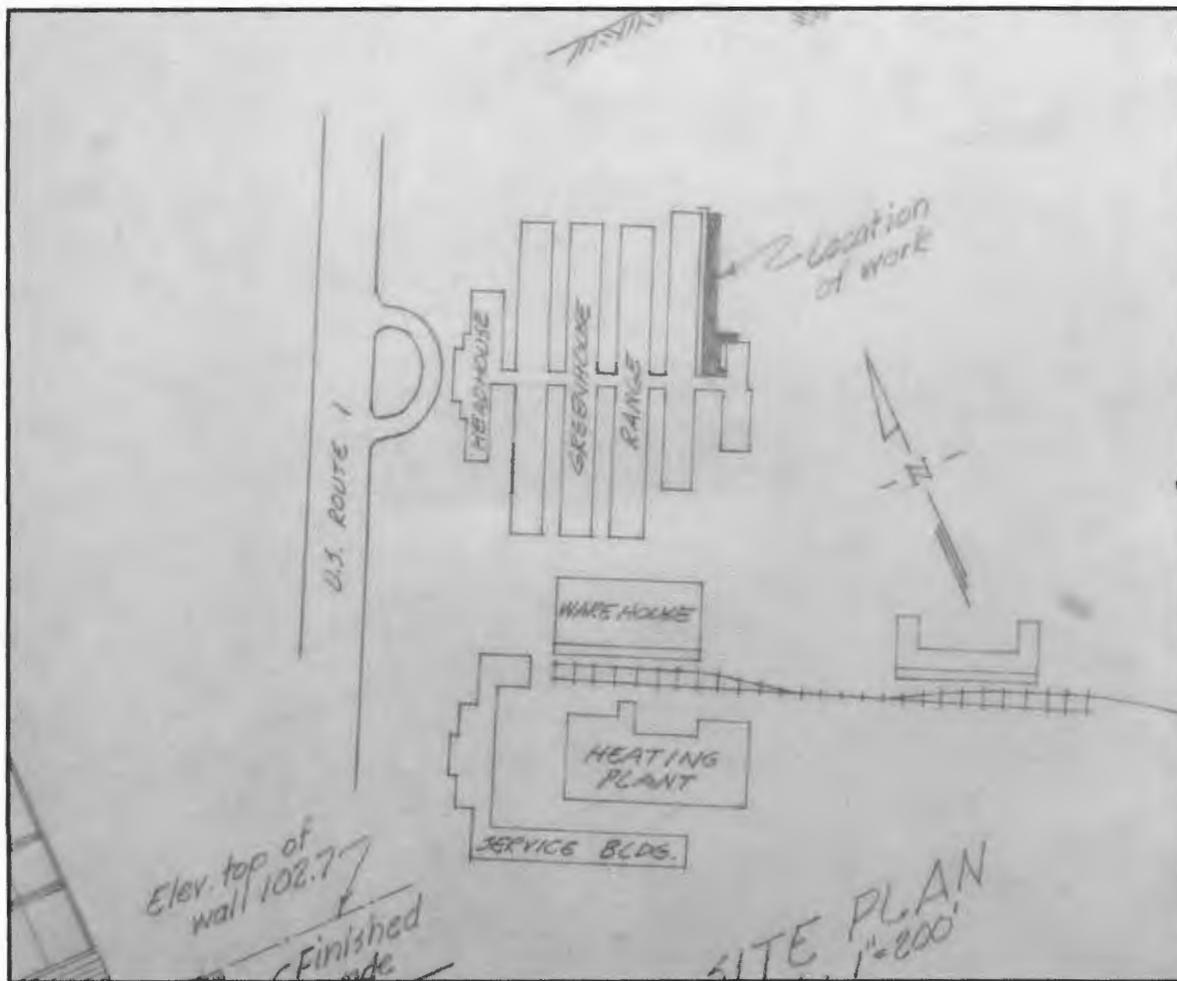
1958 site plan showing proposed expansion of the Harrison Laboratory greenhouses. The drawing is labeled "Pot, Storage Bins, Retaining Wall and Paving Harrison Laboratory." (University of Maryland facility archives.)
